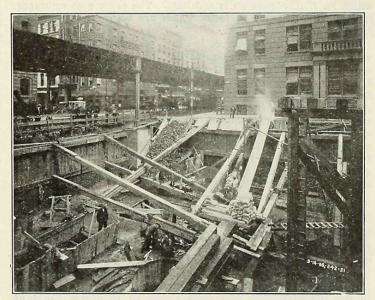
CORNER OF THE FOUNDATION, SHOWING THE MASONRY WORK NECESSARY TO SUPPORT THE ELEVATED RAILROAD AT THAT POINT.
